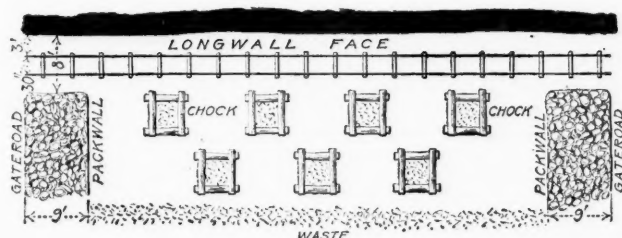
TIMBERING A LONGWALL FACE WITH CHOCKS
